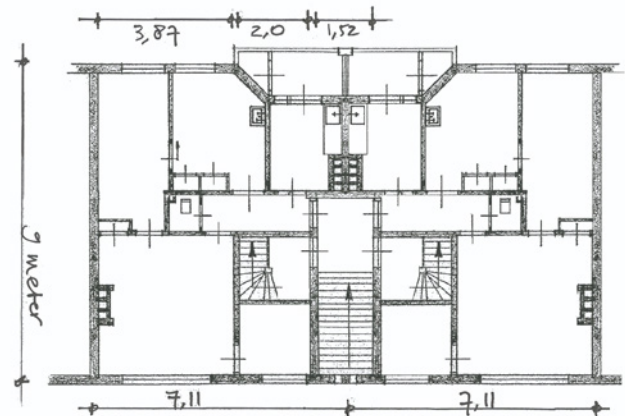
Floor plan of typical walking-up apartments in the Netherlands
